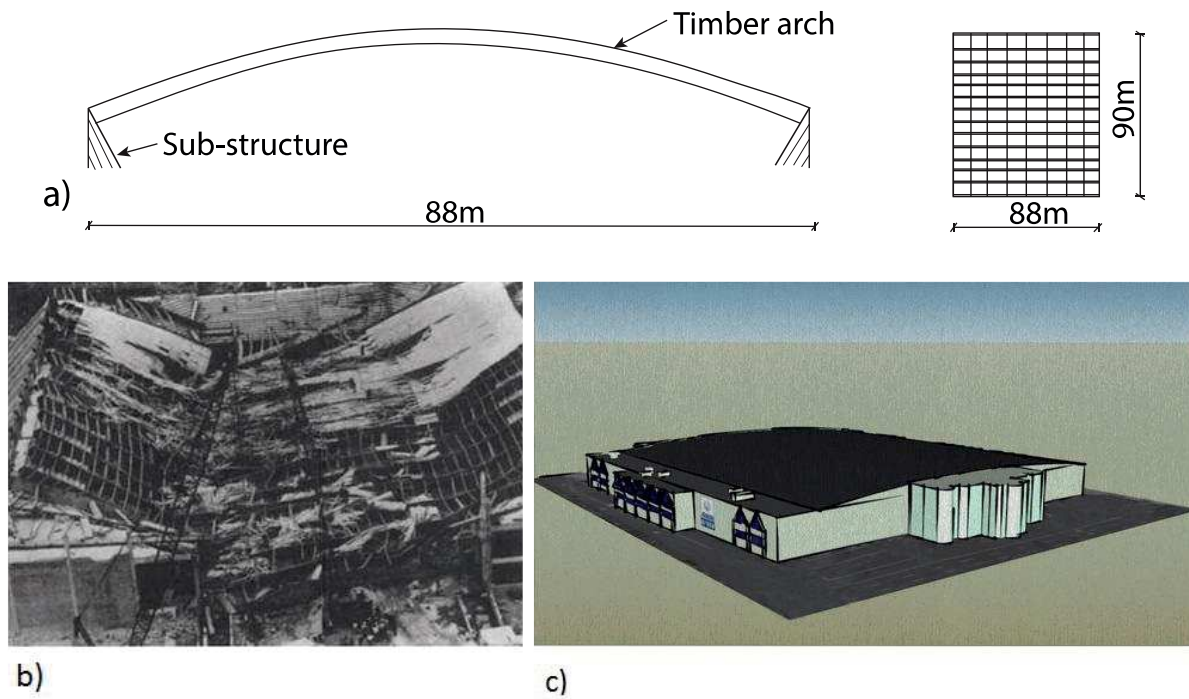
The collapse of the Rosemont Horizon Arena, USA. a) A sketch of the structure. Note that there is no stabilizing bay. b) A picture taken after the collapse. c) What the building looked like after finalization (it was rebuilt after the collapse). (All images in public domain - downloaded from <https://failures.wikispaces.com>)
